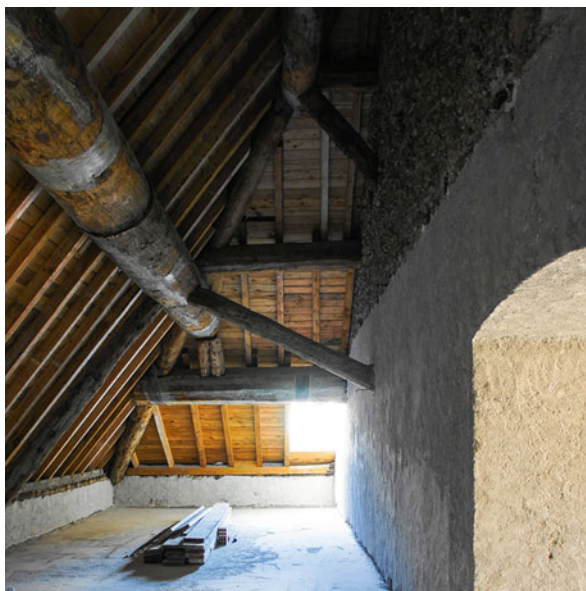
Flat frame system in the northern tower: the horizontal purlins rest on a spine wall and on pillars built over large masonry arches; their span is reduced through the insertion of braces. Below the roof, we have an example of a hanging wattle vault
